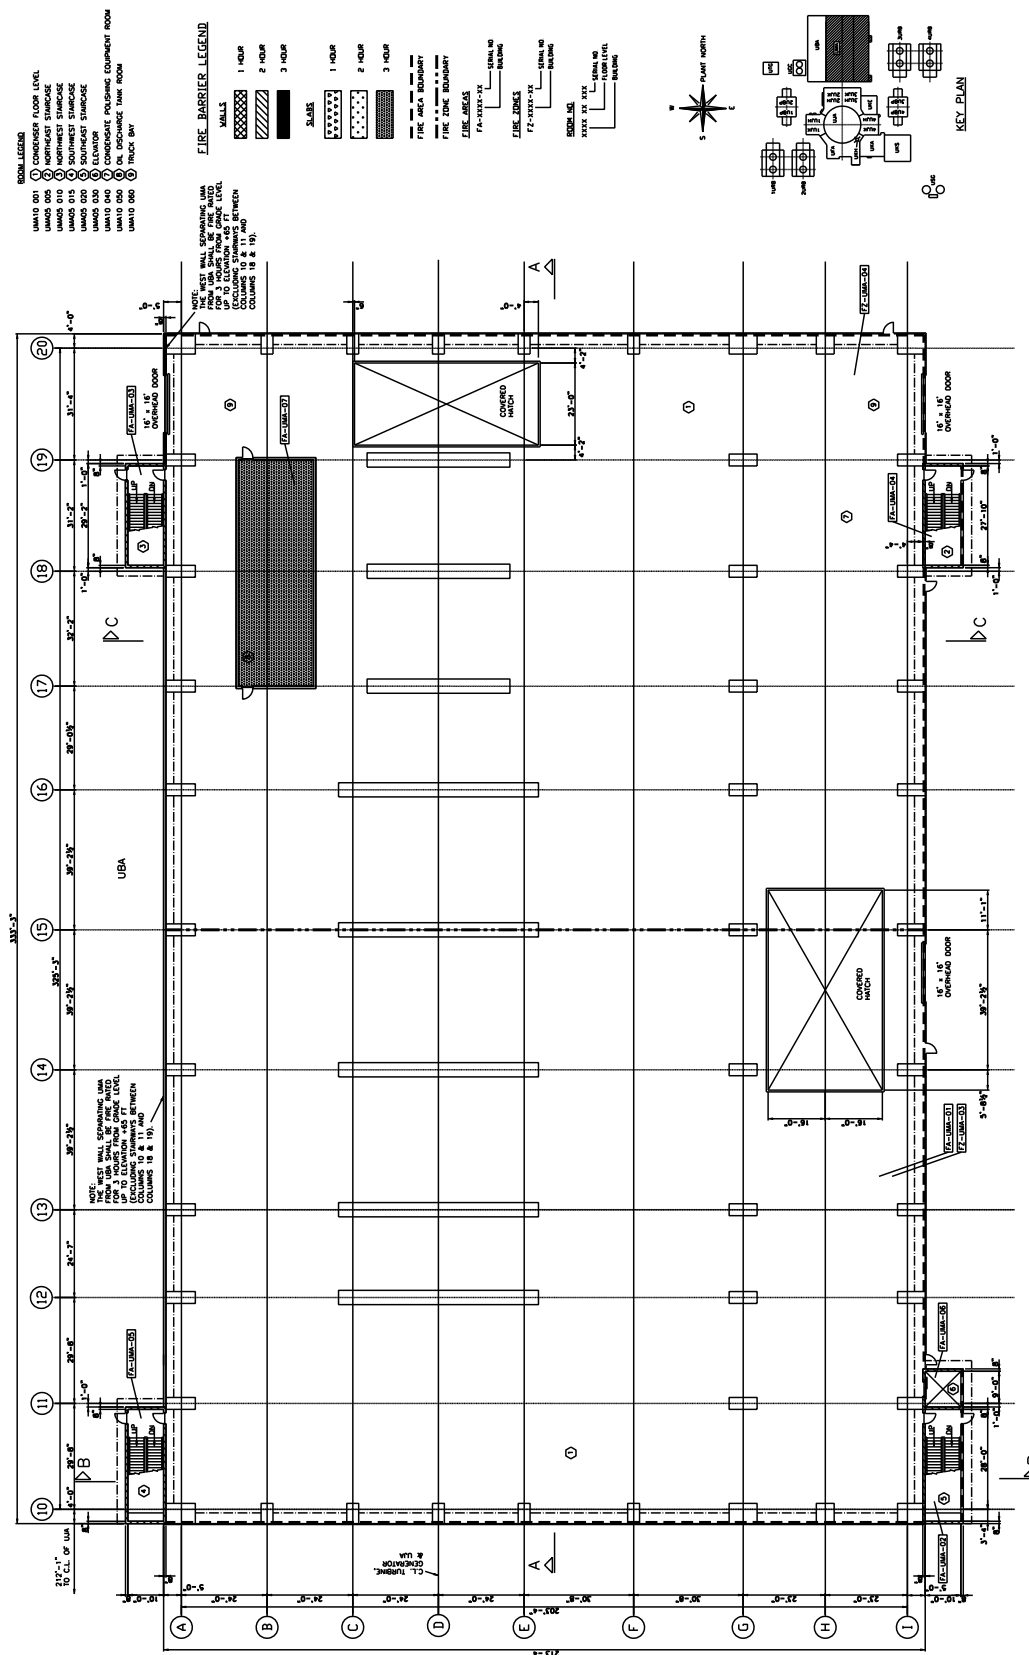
B-3 — {Fire Barrier Location, Turbine Building Plan at Elevation +38 ft}
